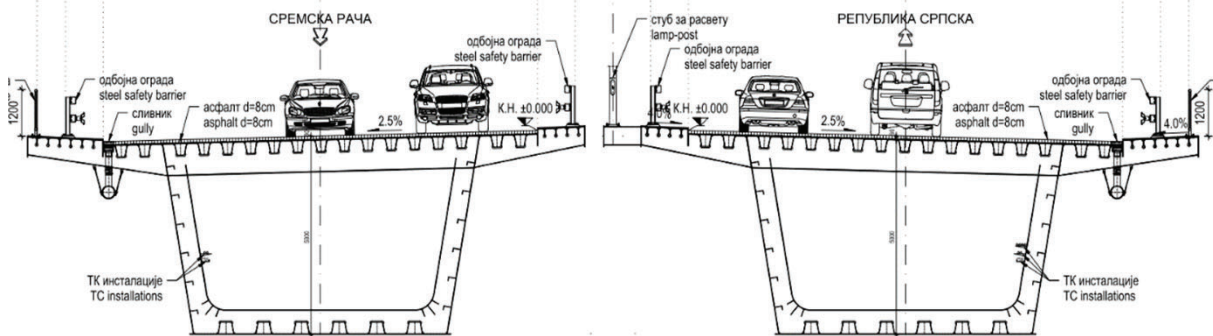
Highway Bridge across the Sava River – Cross Section [6]
